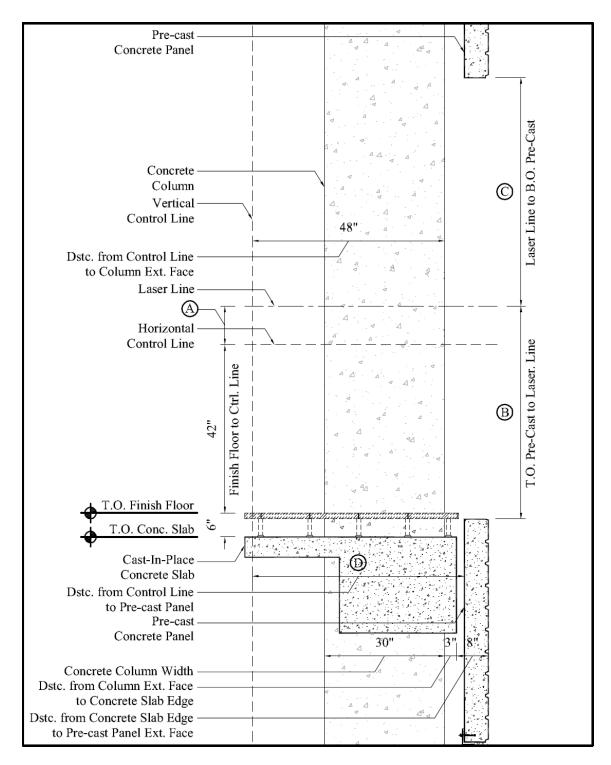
Partial façade section from 8th to the 11th floor without curtain wall. Letters A, B, C and D denote the location of the cladding systems with respect to the control lines. Adapted from Dietzmann, J. M., Jr. (2014).
